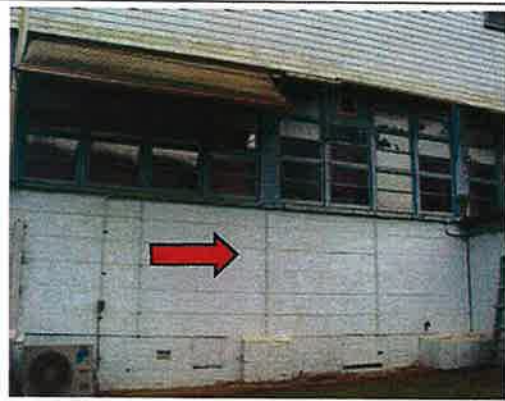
Exterior, Storey Ward, Northern Annex, Fire exit, Infill panels above and below windows – Asbestos containing fibre cement sheeting
